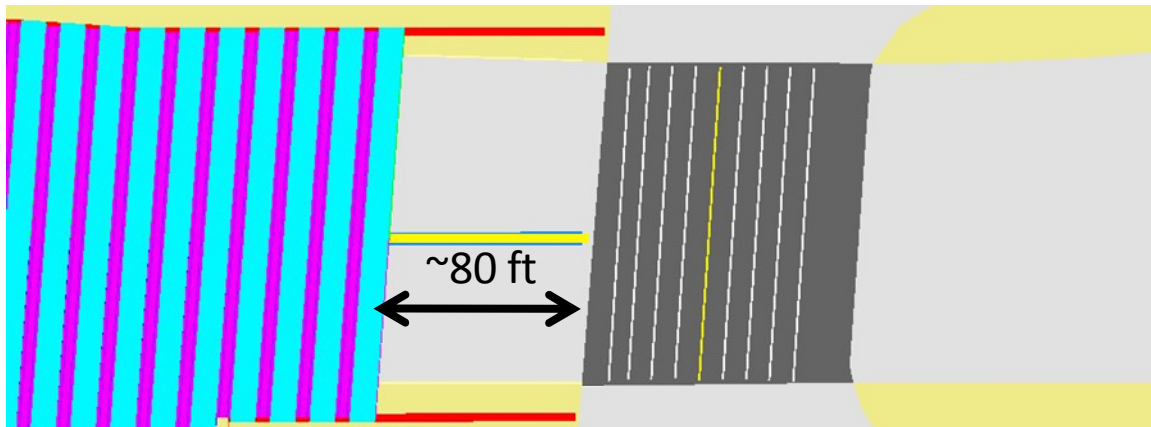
Clearance Between Cross Street Bridge and Beams Already in Place
